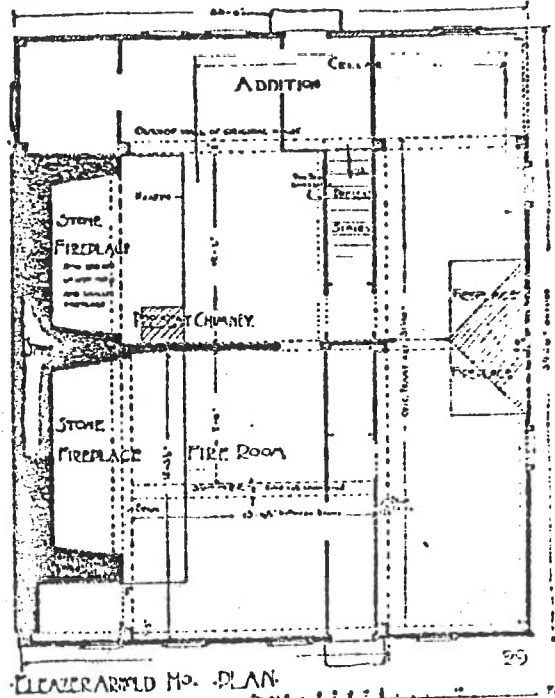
Eleazar Arnold House, Great Road, Lincoln, 1687. Ground storey plan. From Isham and Brown, EARLY RHODE ISLAND HOUSES, 1895.
